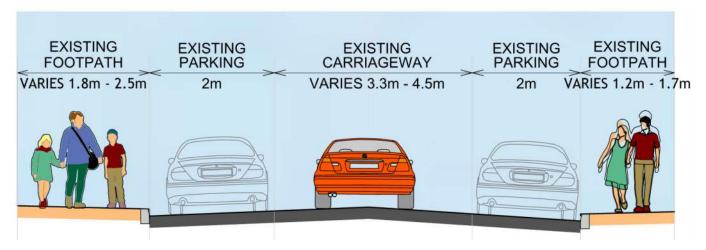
Typical Section 4 Do Nothing Scenario Cross Section SCR between Laurel Hill Avenue and Henry St
